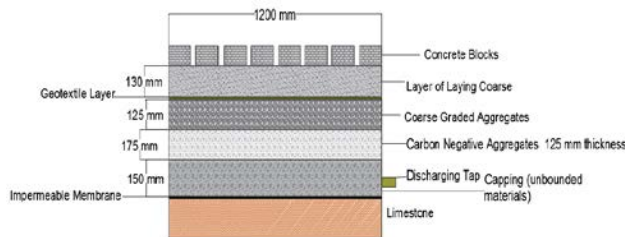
Schematic for Interlocking Permeable Pavement Block System
